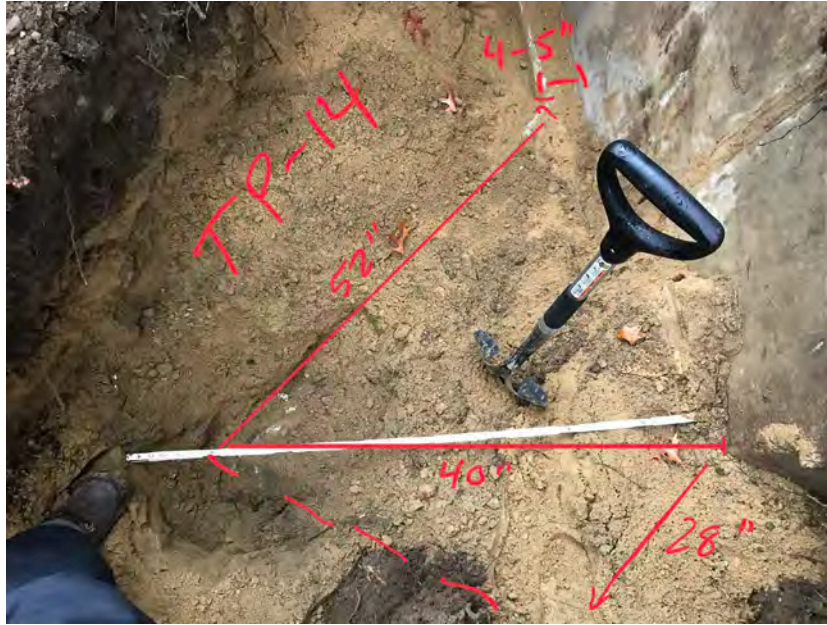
Irregular footing foundation encountered in test pit HA21-TP14 at the existing building corner. Dimensions as shown.
